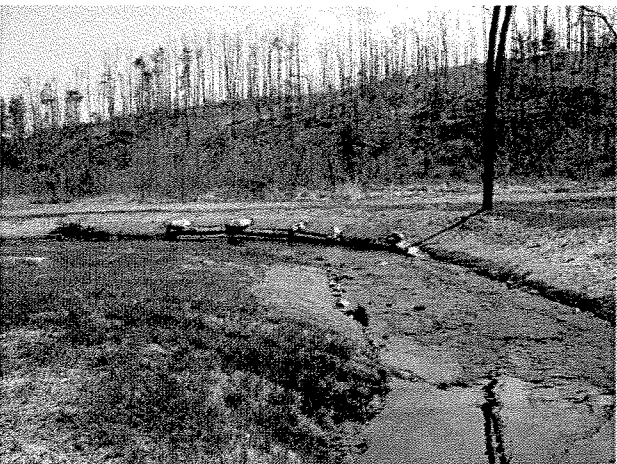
Rock cross vane installed in existing MS channel. (4/7/04)
